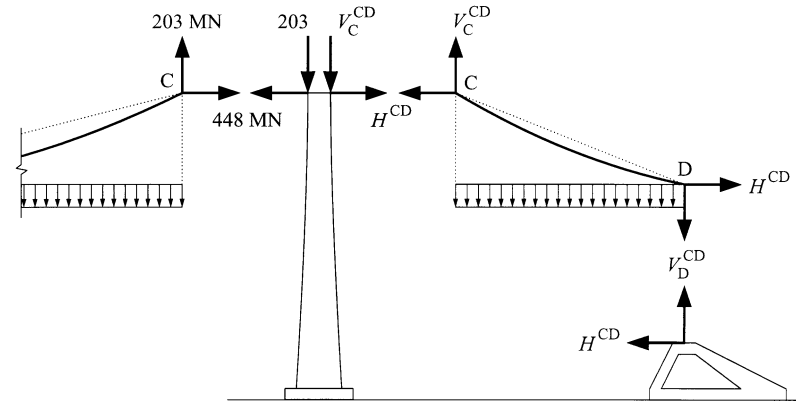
Cables BC and CD isolated from tower C and foundation block D.
